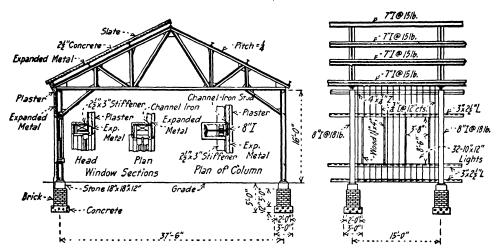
STEEL FRAME BUILDING WITH PLASTER WALLS.
